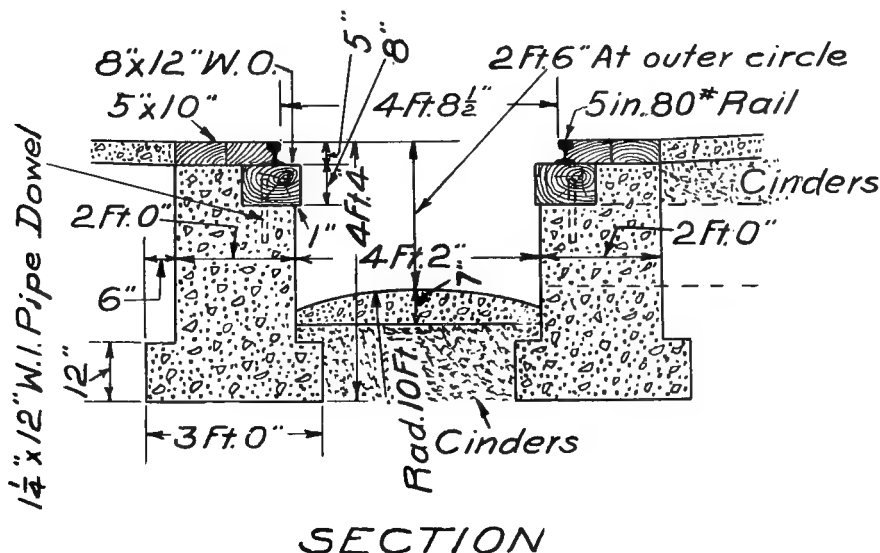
CROSS SECTION STALL PIT, WATERBURY ROUNDHOUSE.
